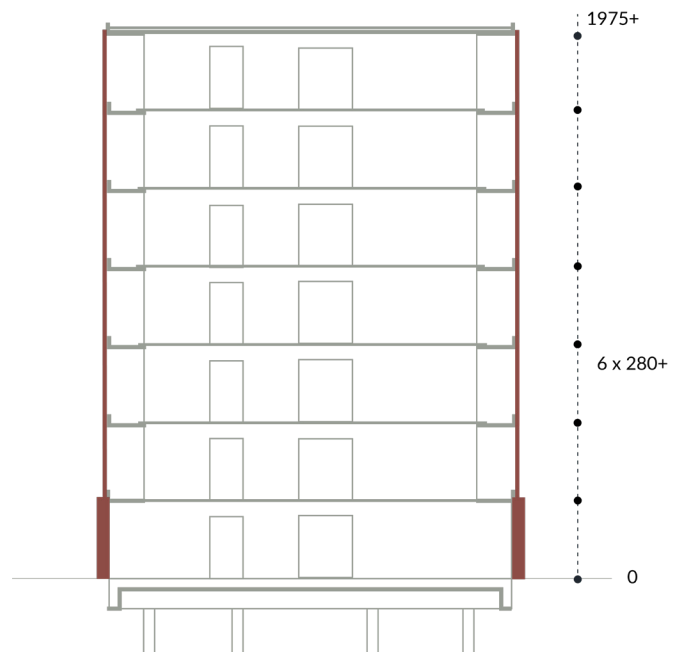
| Schematic Design of Second Skin Panel and structural reinforcement
